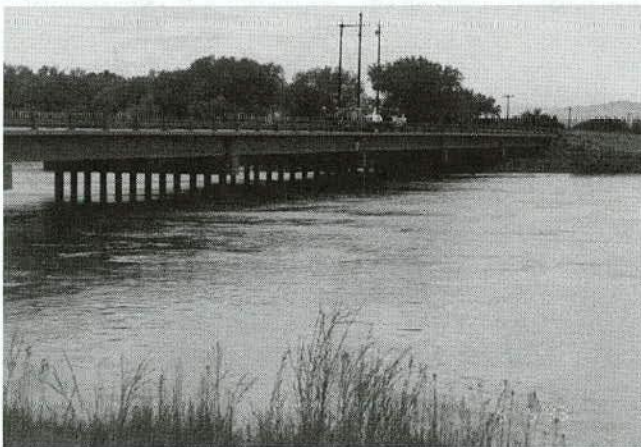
Upstream face of Bernardo bridge (Site NM1).
